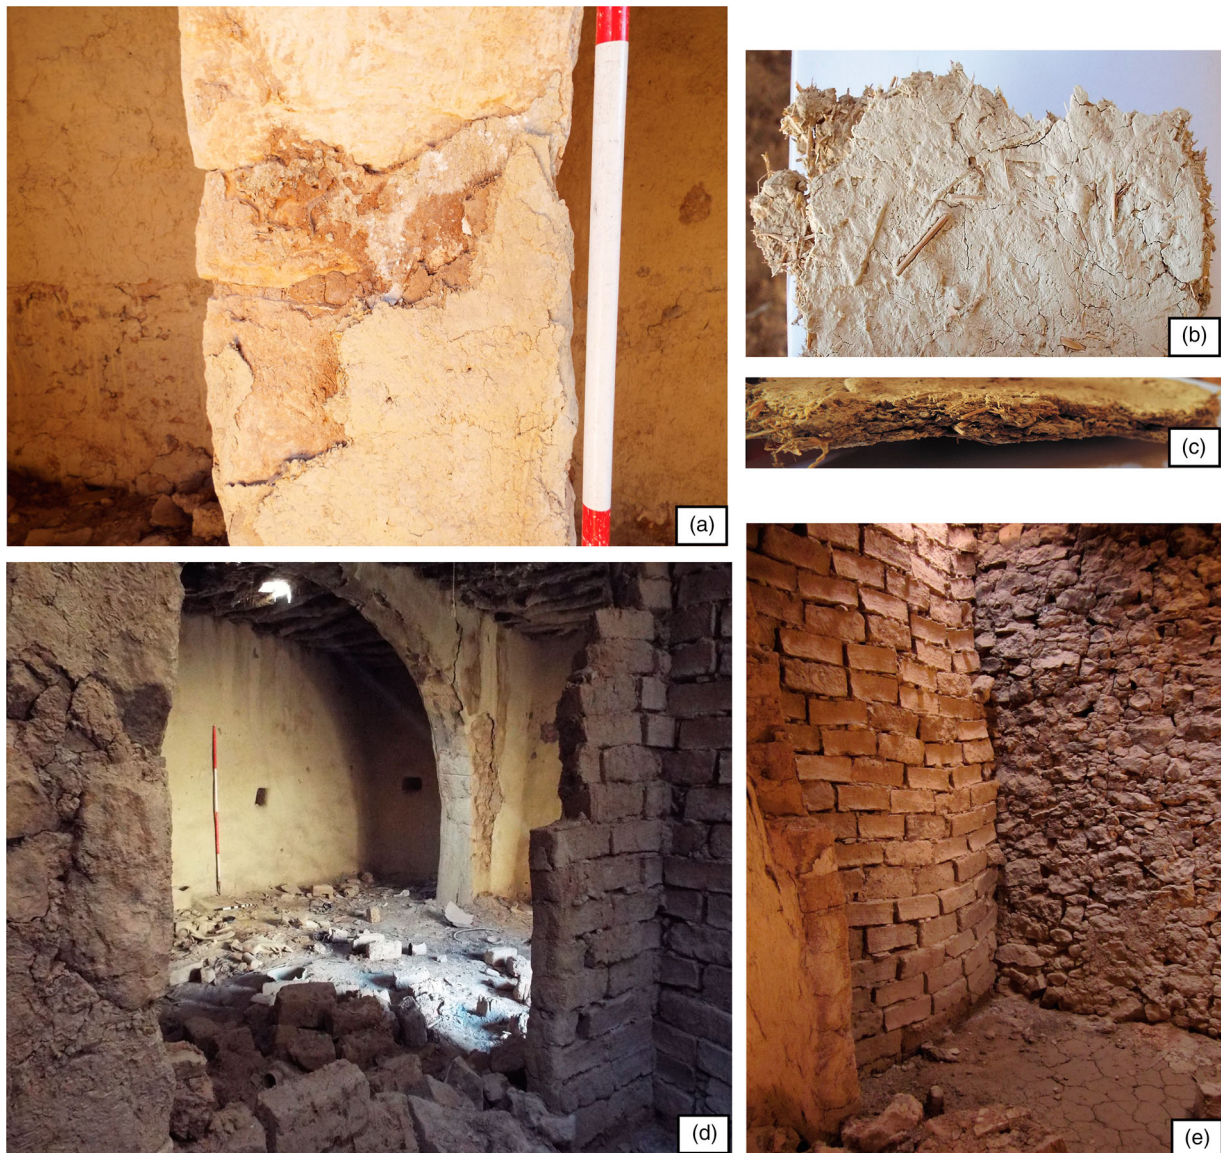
Al Ma'tan walls: (a) stone constructed wall with mud mortar covered in straw tempered clay plaster, Building 10; (b,c) Detail of straw tempered clay plaster; (d,e) mud brick internal walls, Building 65.
